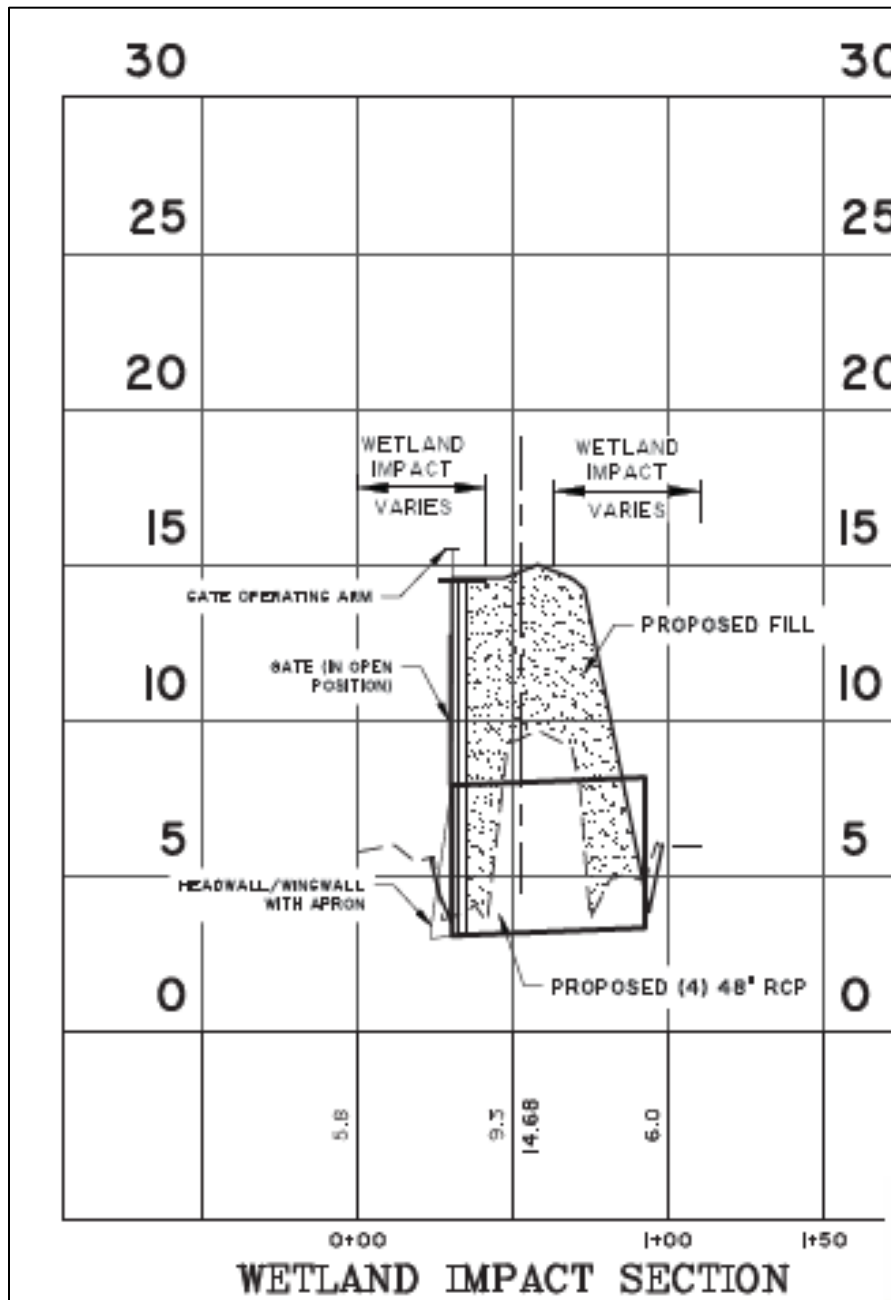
Proposed Wetland Impact Section cross section for Big Bull Landing Road Raising
